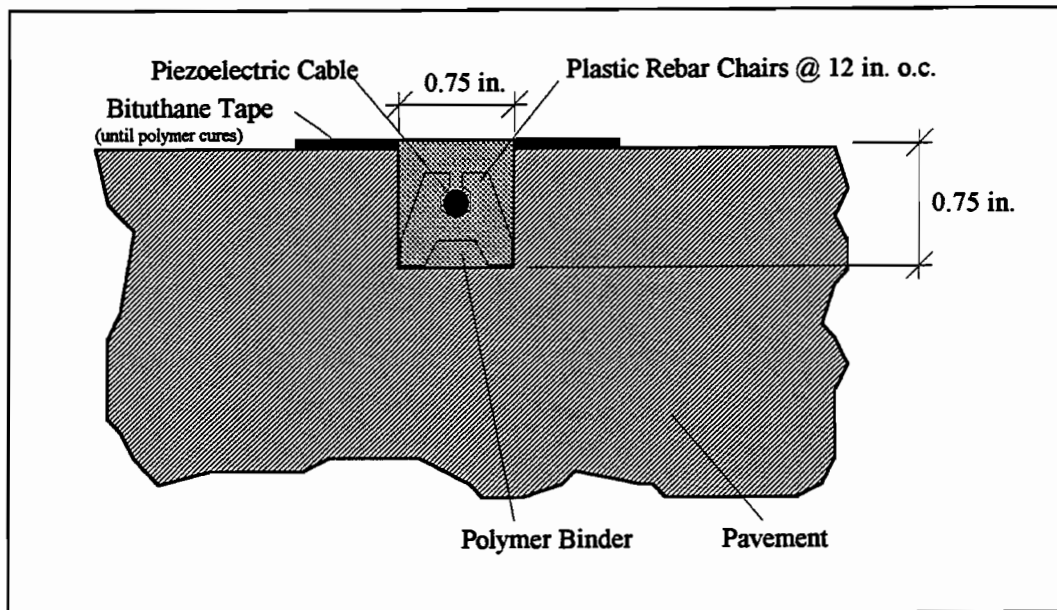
Bare Cable Sensor (Installed) (1 in. = 25.4 mm)
